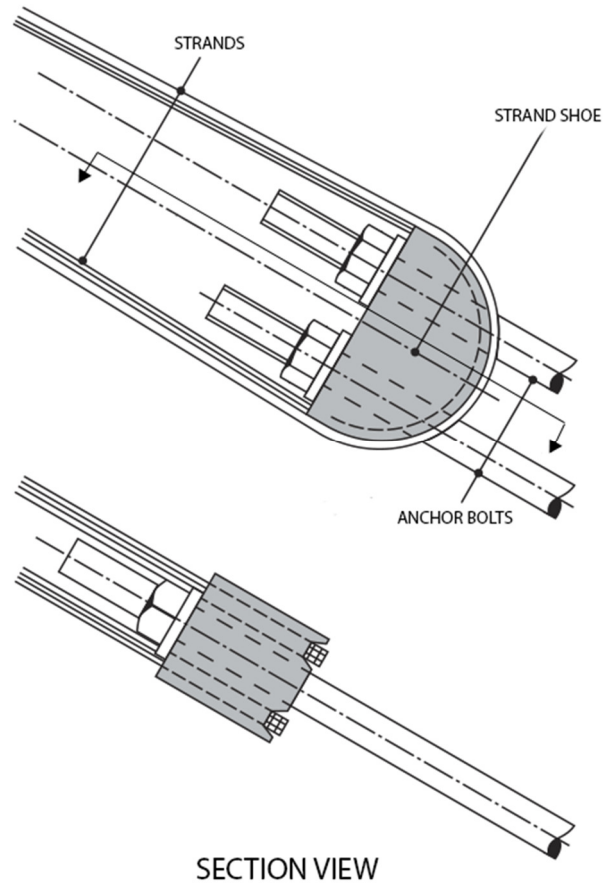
Strand shoe used for anchoring main cable strands into anchorage block
